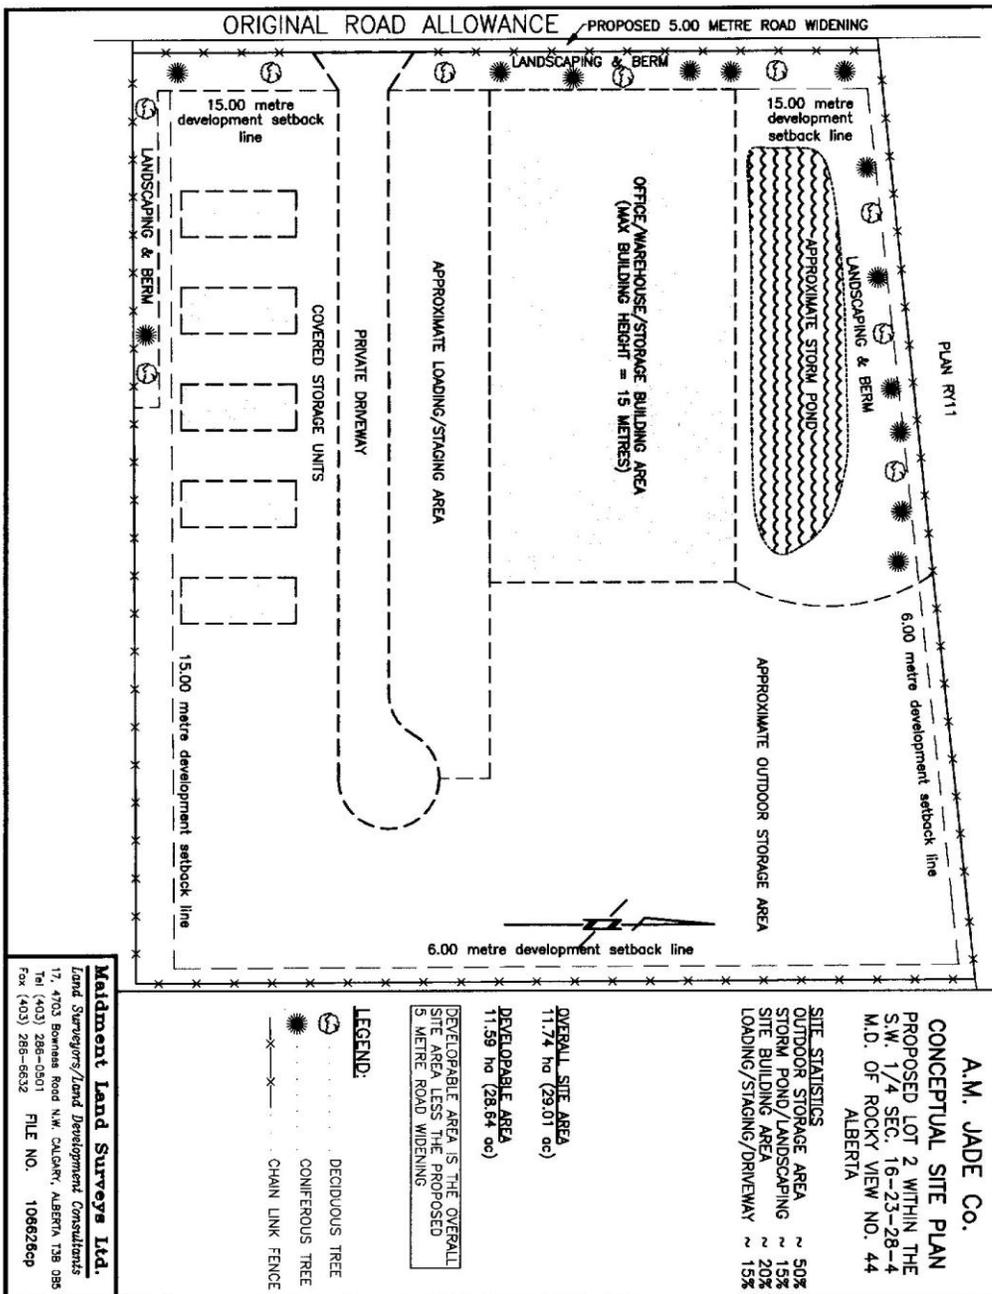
Concept Site Plan – Lot 1 – AM Jade Co. Inc. Shepard Property.
